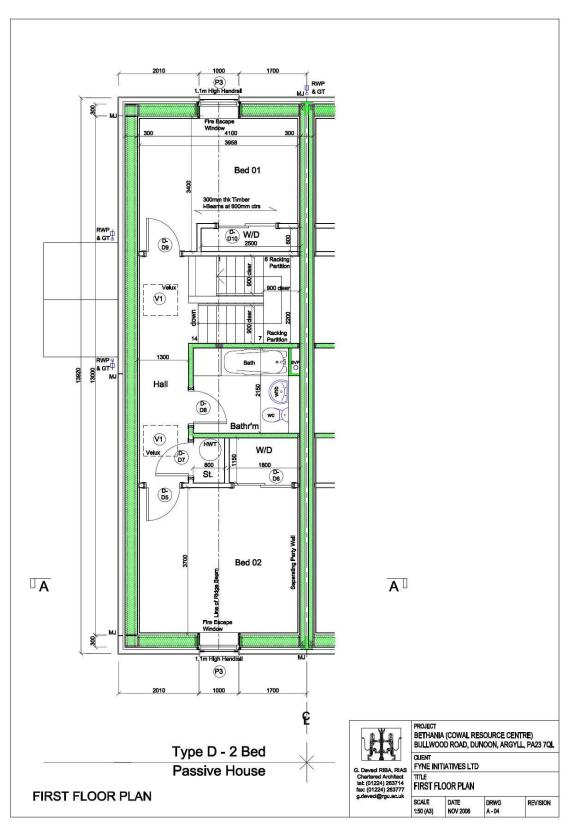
First Floor Plan of the Dunoon Passive House (source: Fyne Homes)
